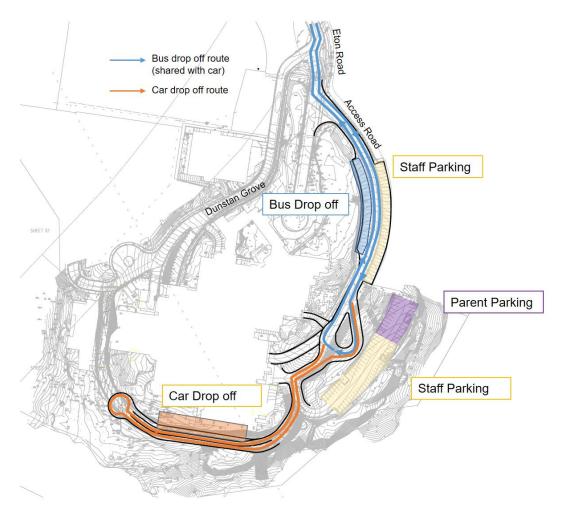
Overall layout of the expanded roundabout for buses and new car pick-up road
